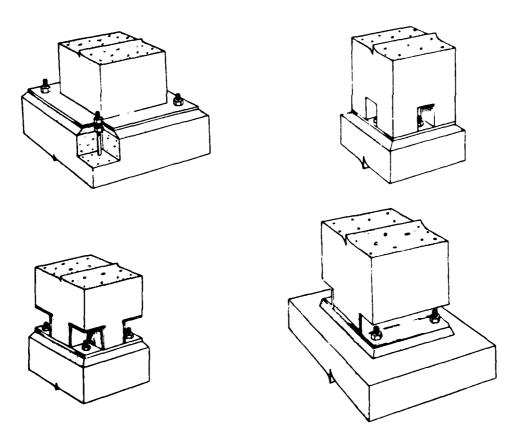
Precast Column Base Connections (Ref. 17).
